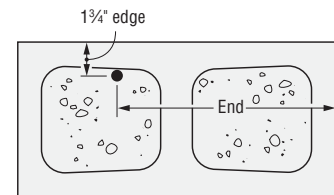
Anchor Installed in Cell Opening (Top of Wall)
